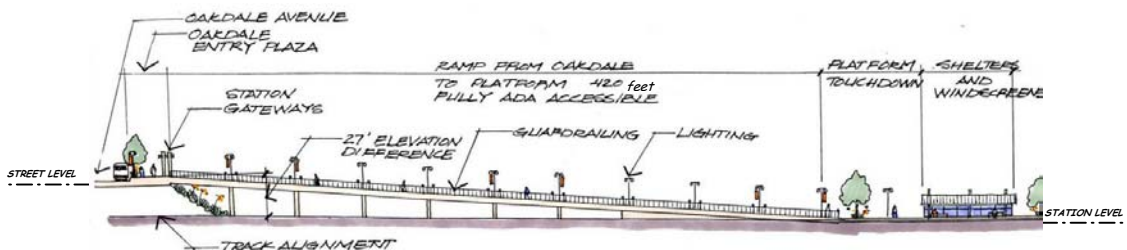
Elevation of west ramp connecting plaza and platform, looking west
